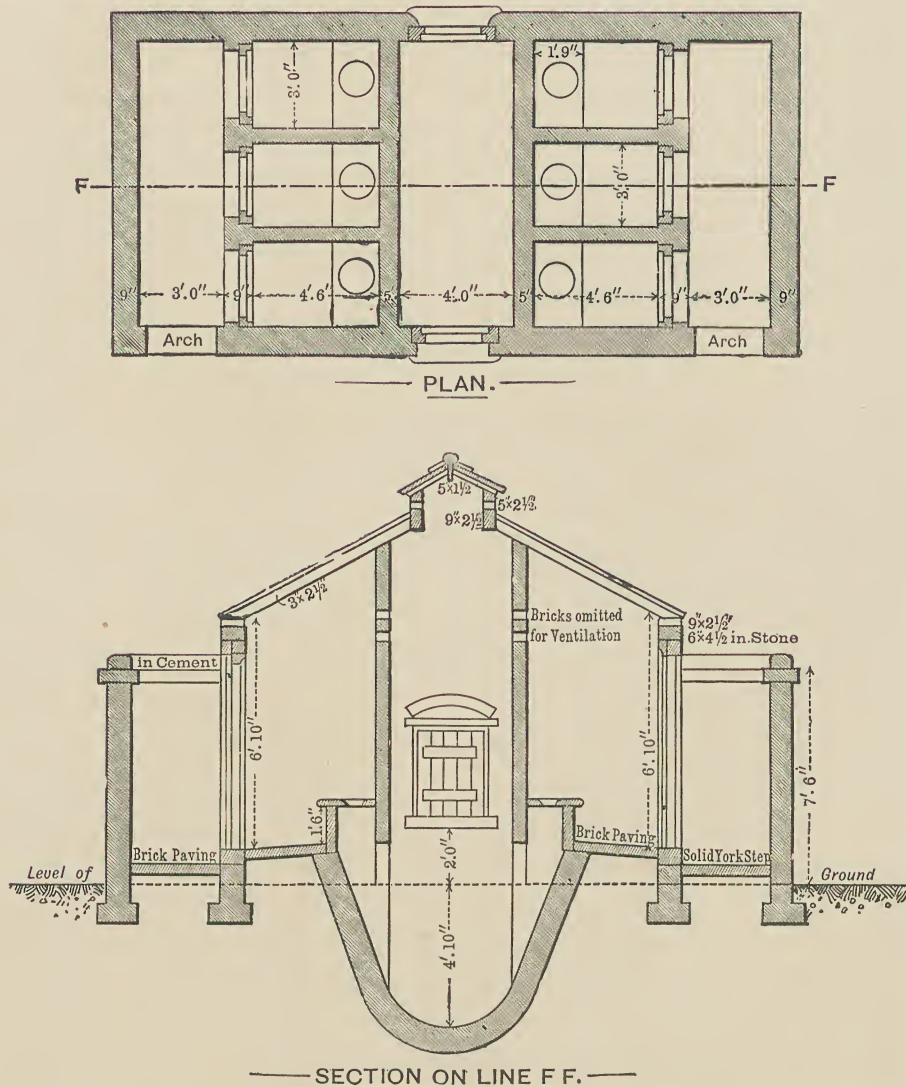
Plan and Section of Midden-closet in use at Nottingham.
